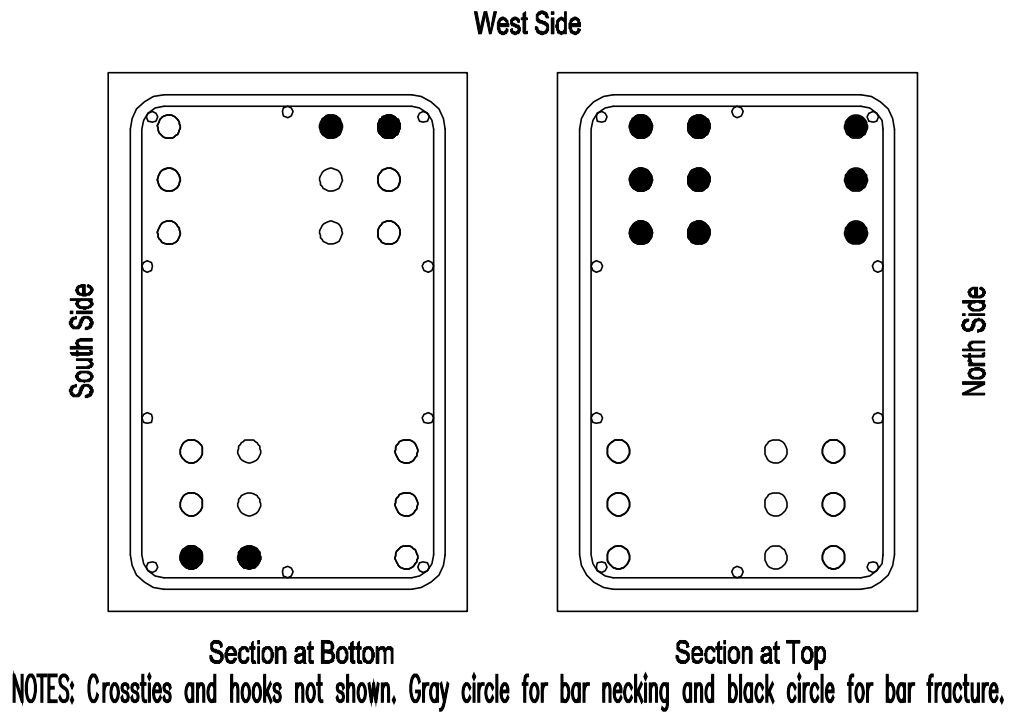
Reinforcing bar fracture locations, D80-2.5
